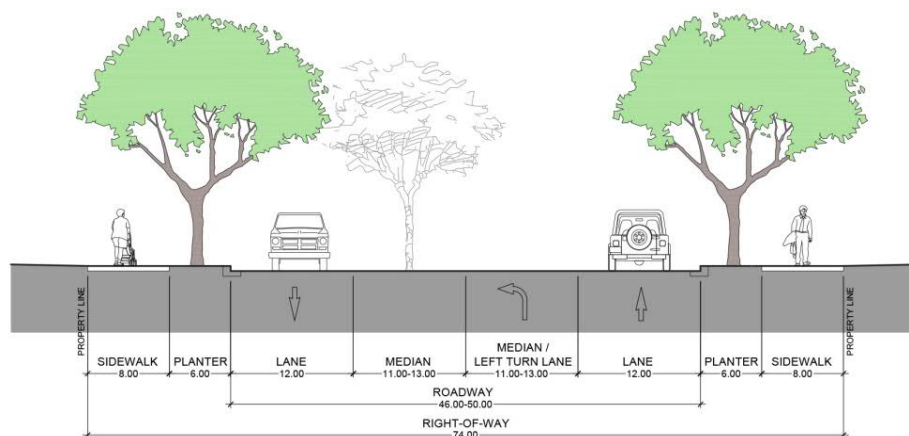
Primary Collector – Eastgate Boulevard Section
